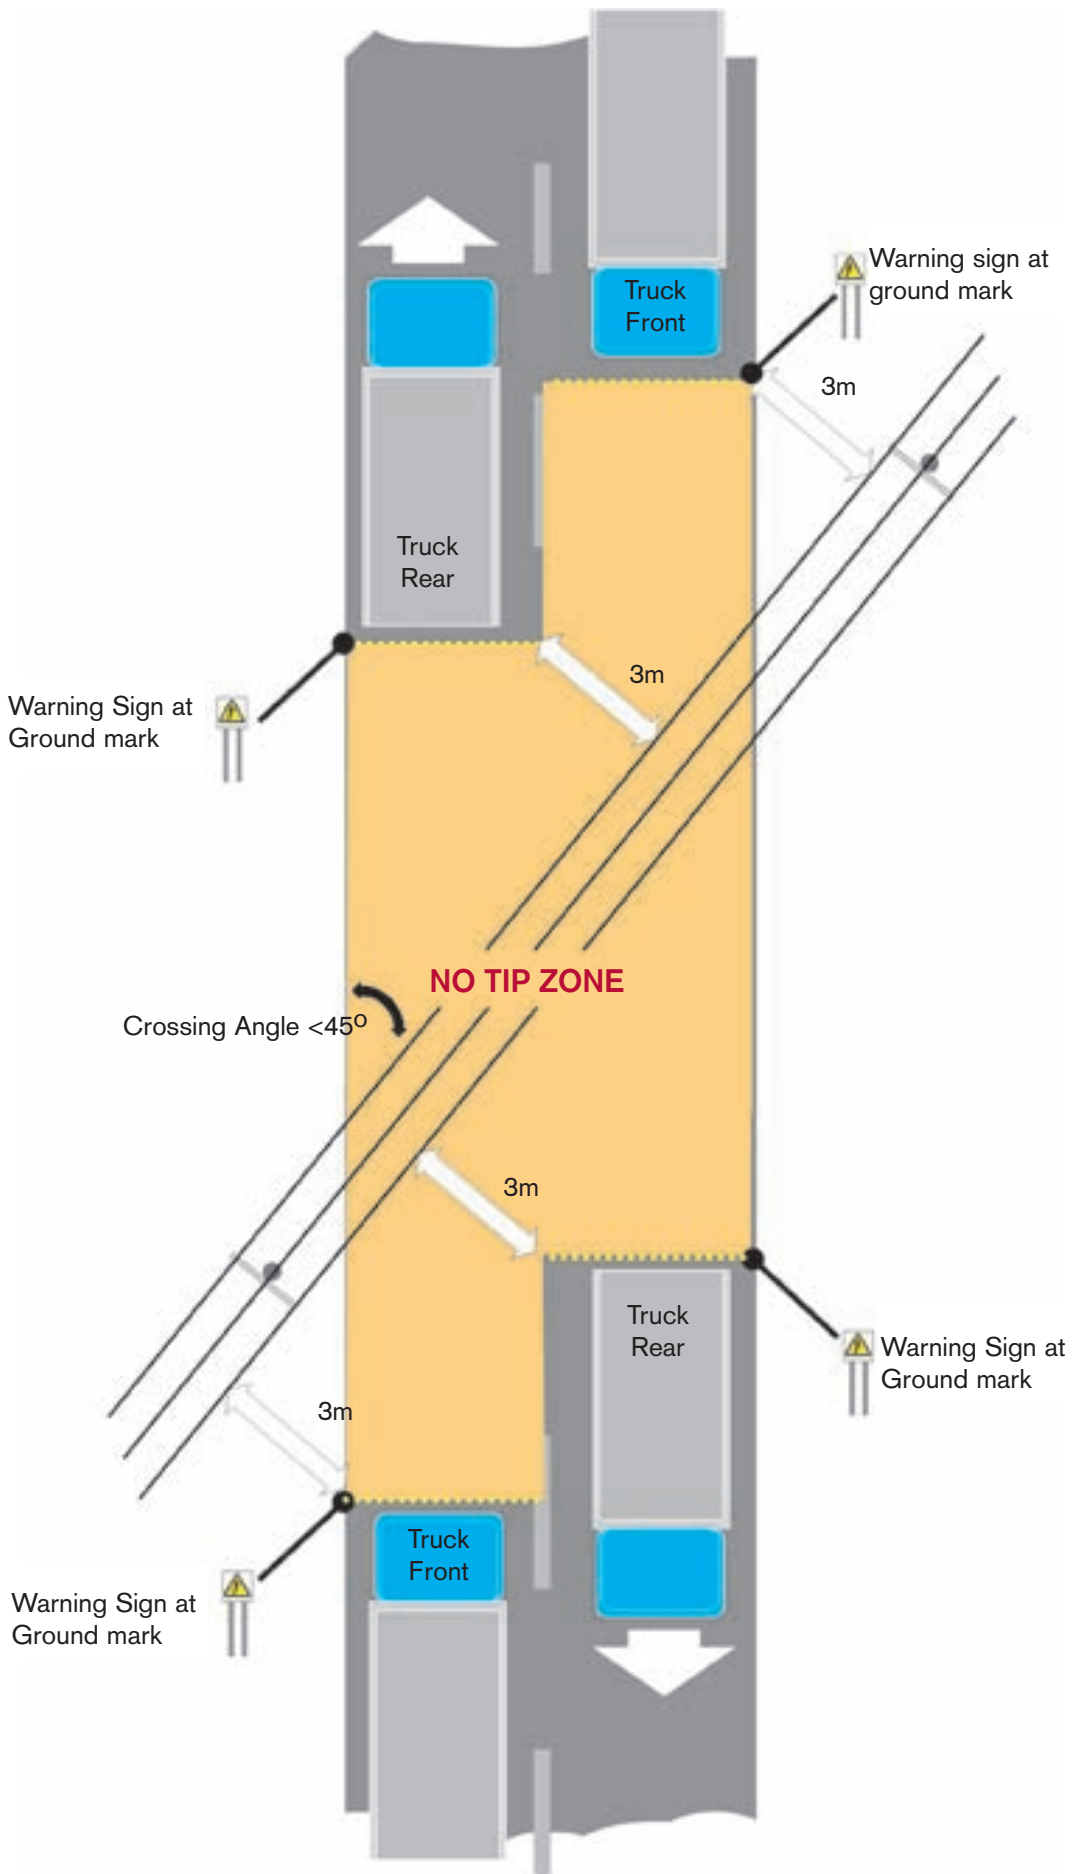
Safe System of Work for road resurfacing only where crossing angle is less than 45 degrees with road
